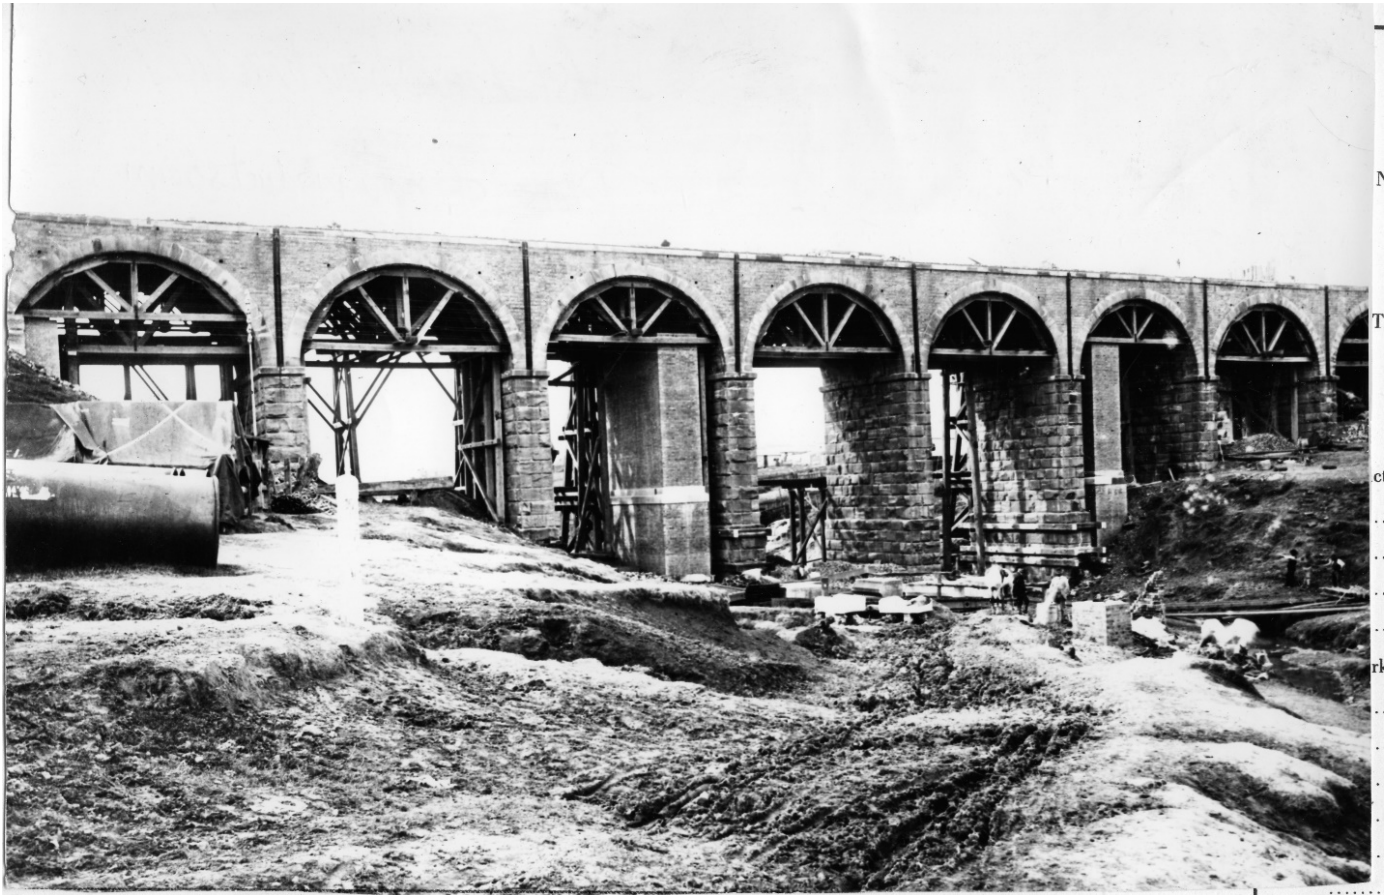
Work beginning on removing the stone bridge. The brick piers for the new iron bridge are complete and formers have been made under every arch to hold them as they are dismantled in a reverse building technique. RRC 5138
